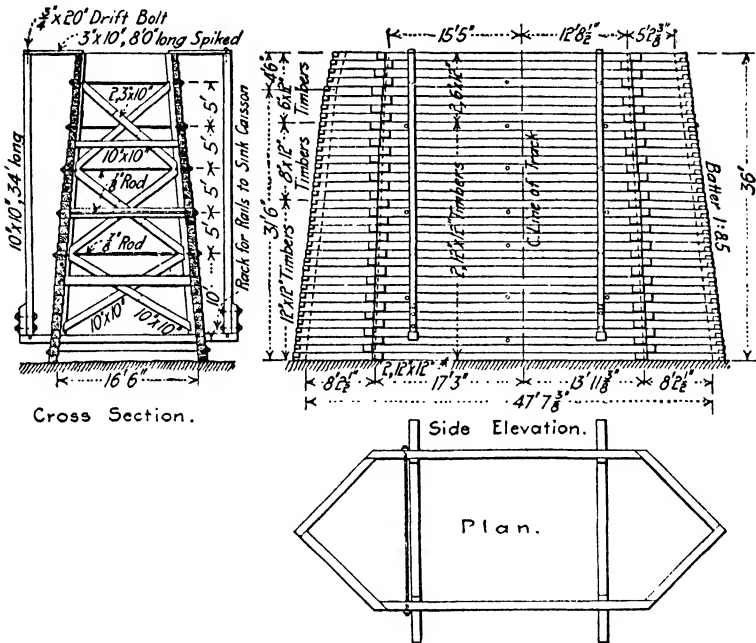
Open Caisson for Piers of Oregon-Washington Railroad and Navigation Company over Columbia River.
